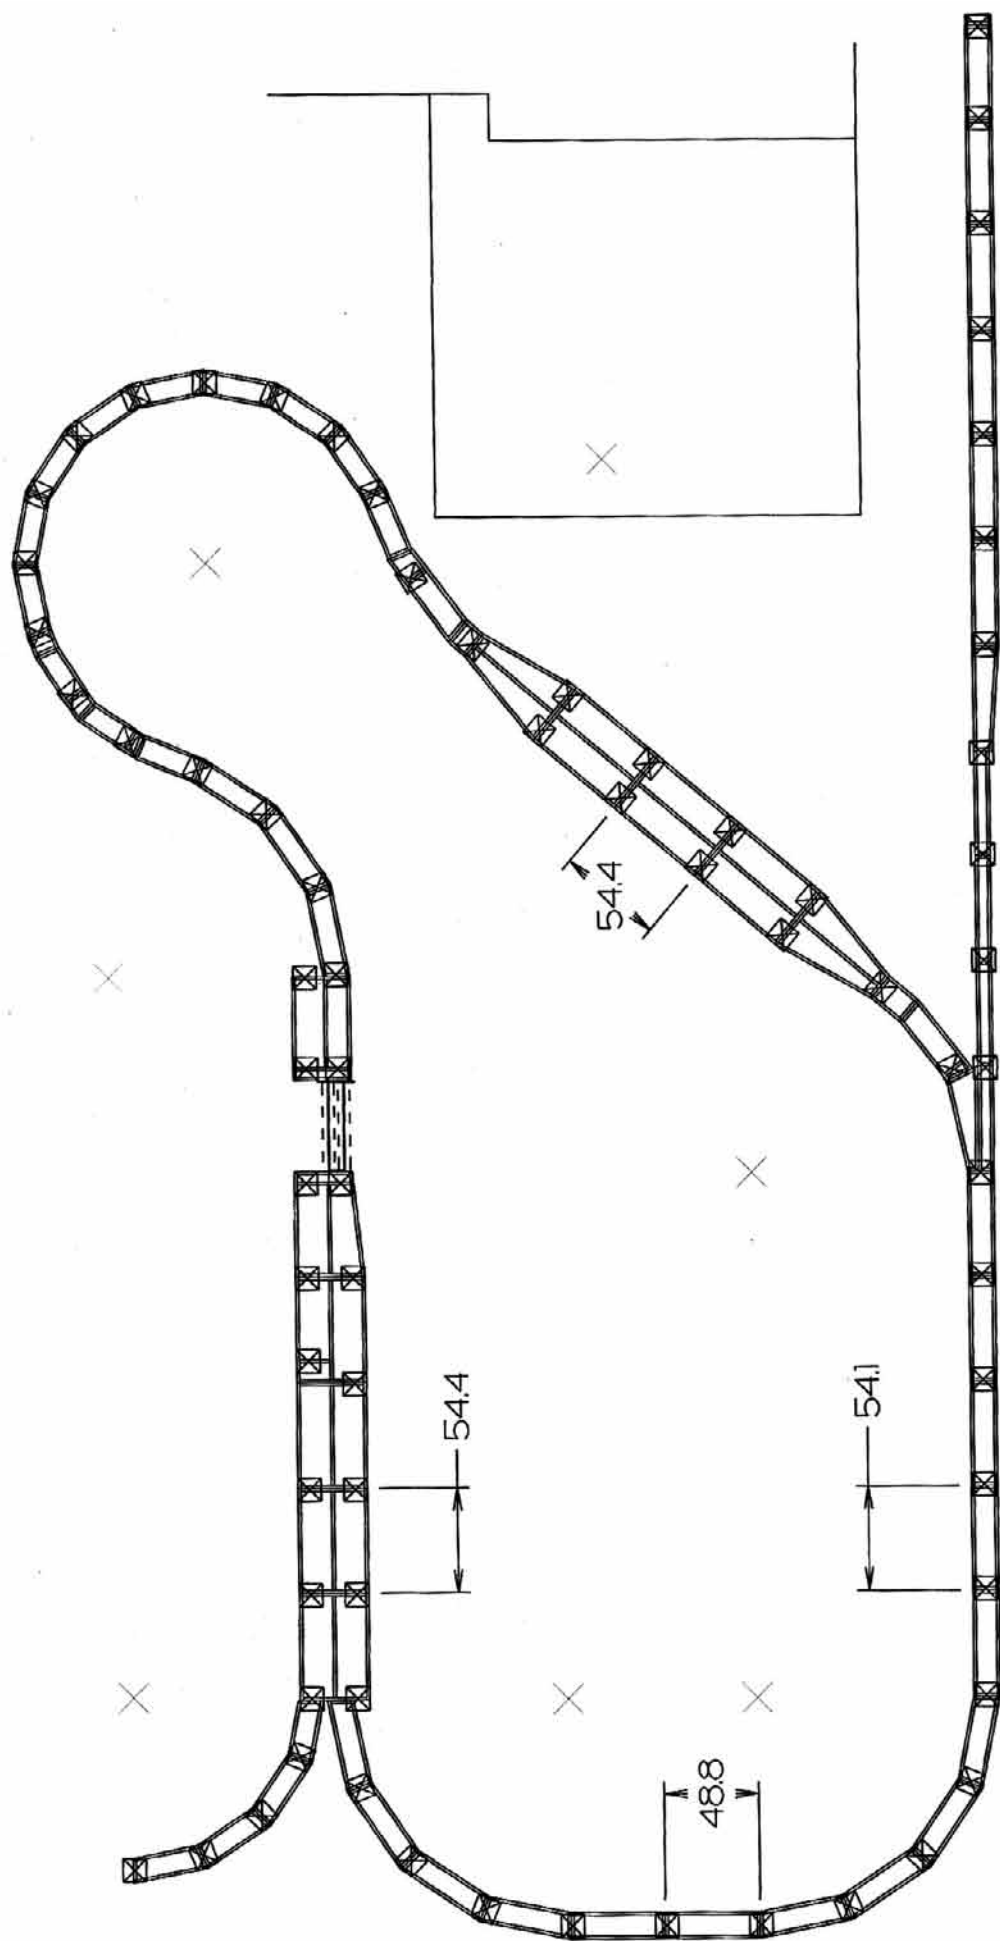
LAYOUT OF RAILROAD FRAMES AND FOOTINGS
